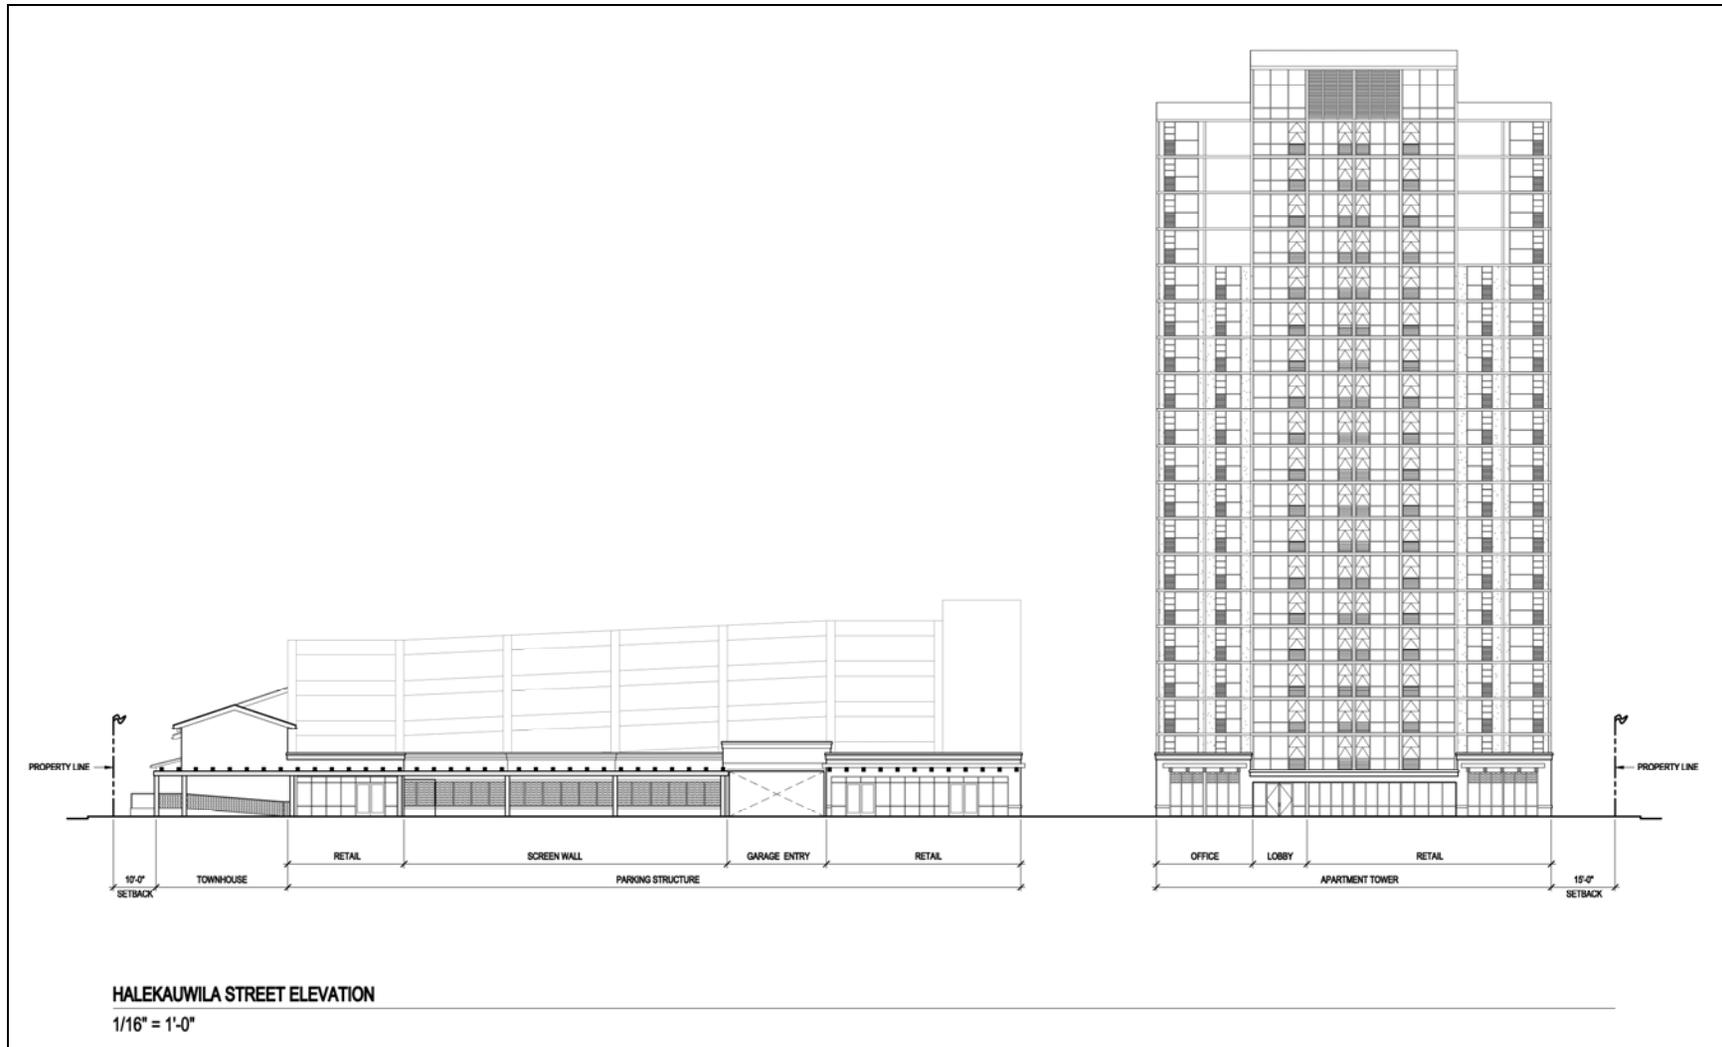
Cross-section diagram of the proposed Halekauwila Place Project (source: Halekauwila Partners, LLC)
